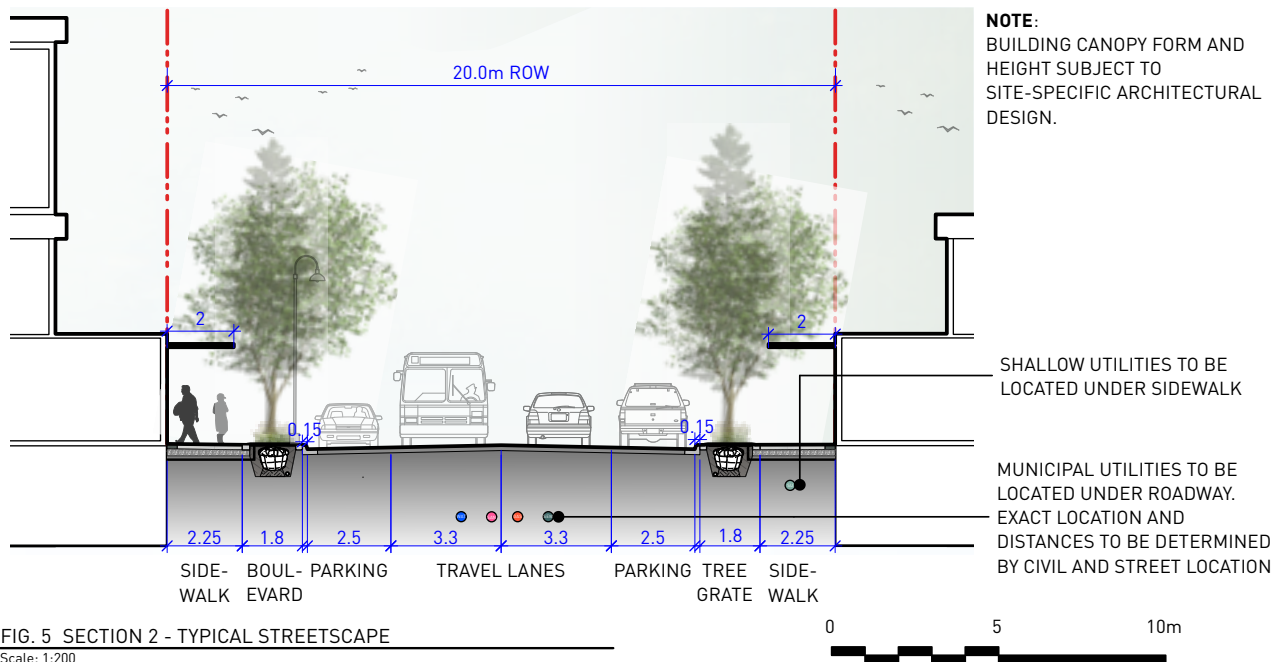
SECTION 2 - TYPICAL STREETSCAPE
